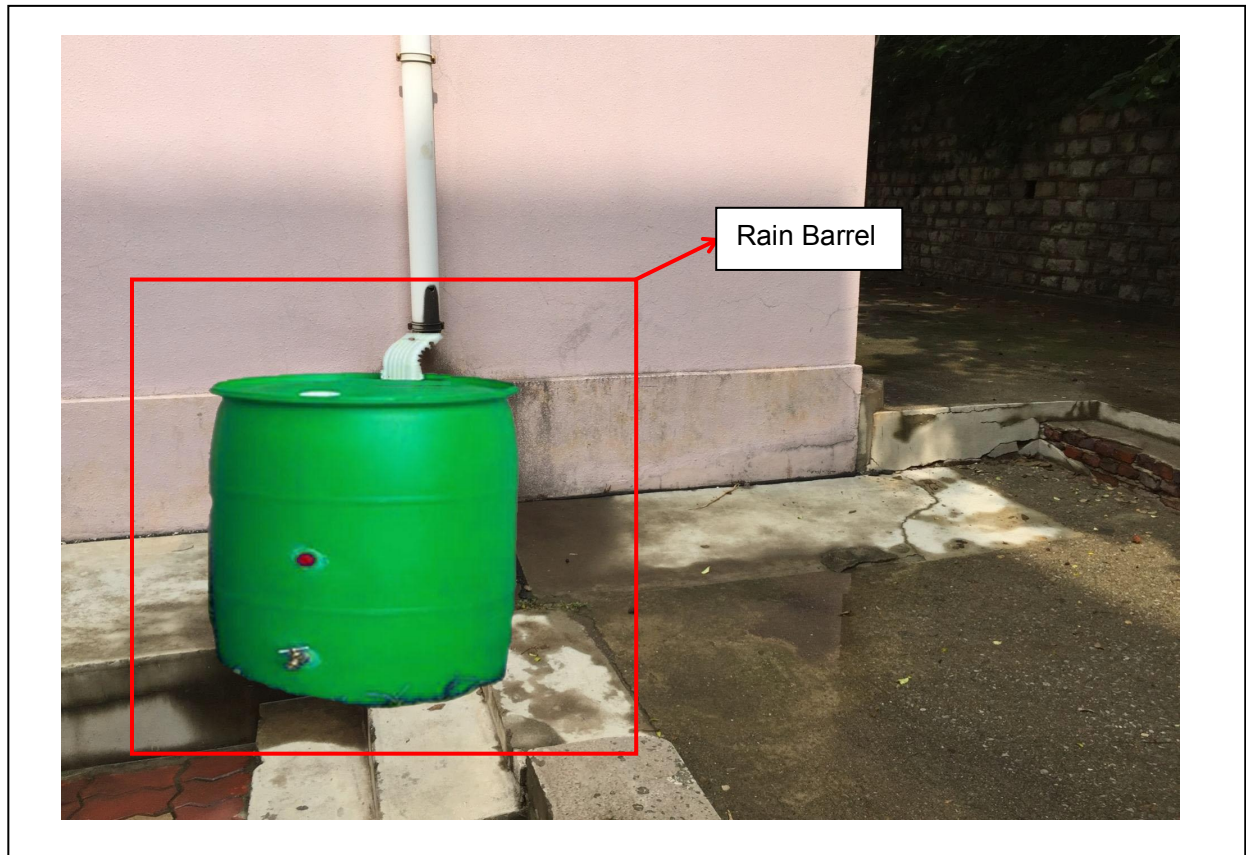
Rain Barrel connected with the roof downspout (Source: WRISD, China)
